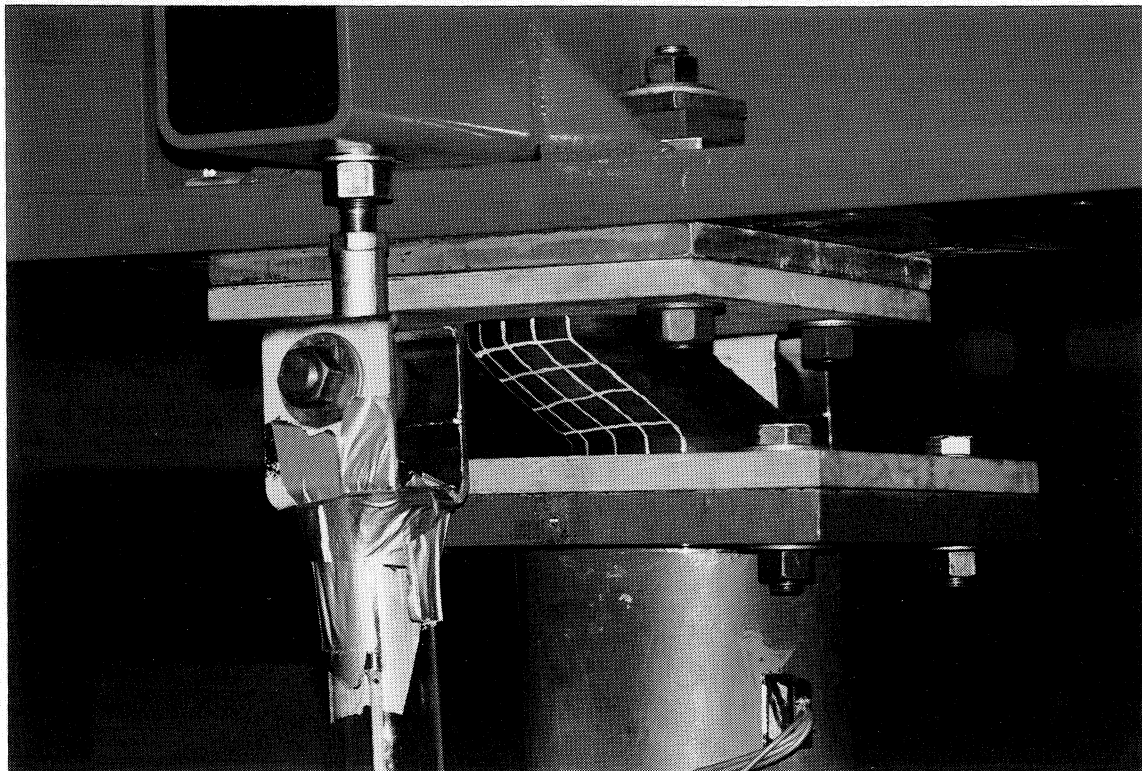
Close-up View of Elastomeric Bearing Testing
